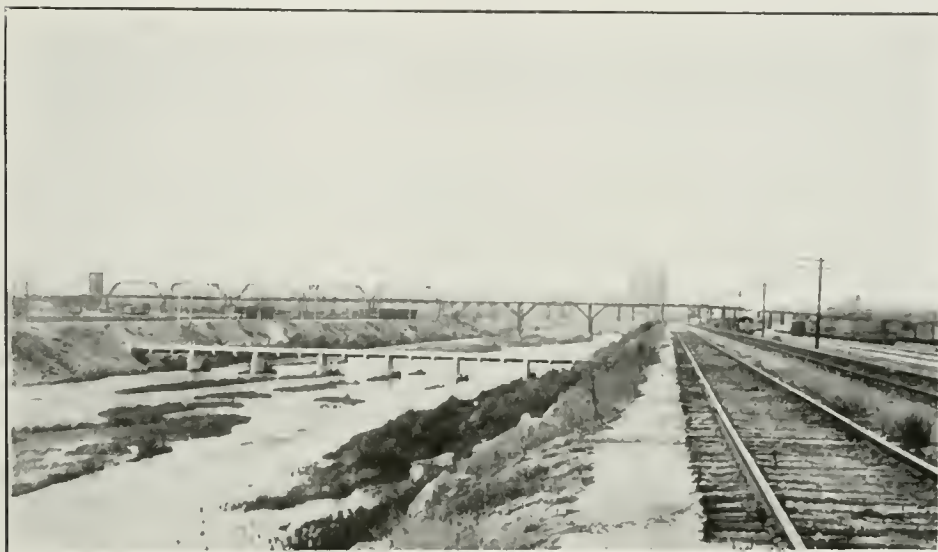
LOS ANGELES RAILWAY BRIDGE ACROSS THE LOS ANGELES RIVER
